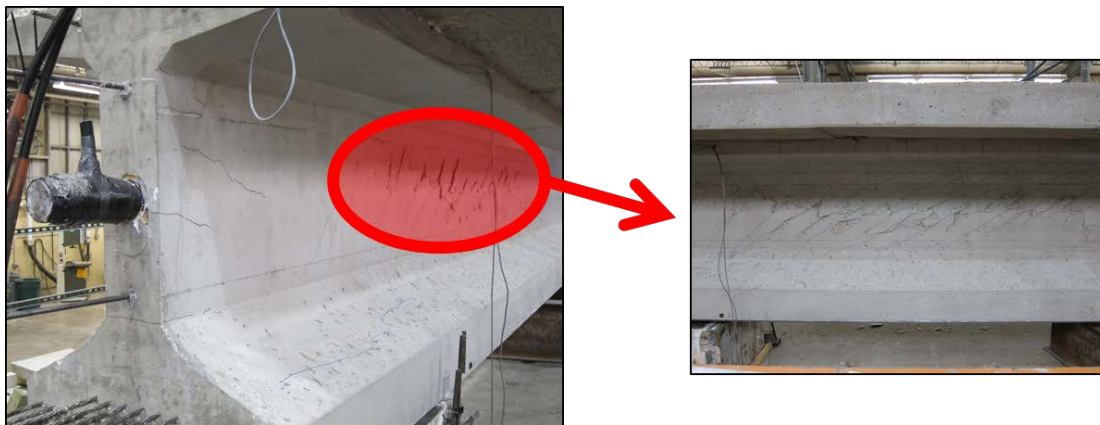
Failure of Tx46 Girder with a Duct in the Web
